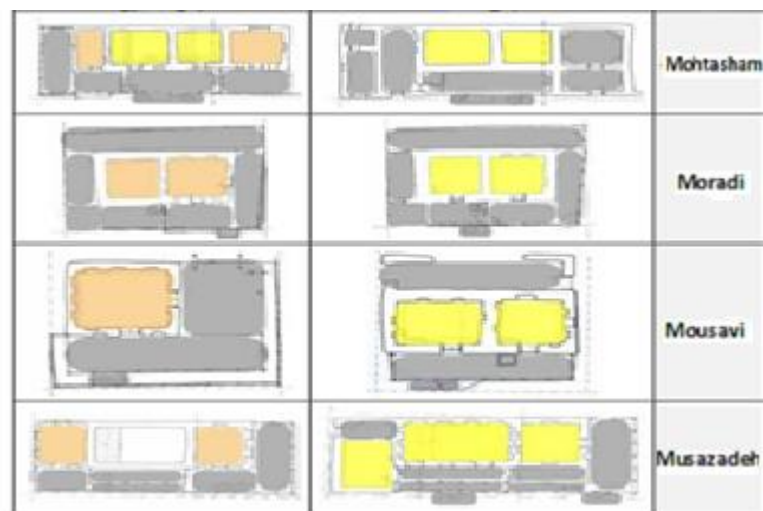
Spatial organization in the inner perspective (right side of ground floor plan and right side of first floor plan) - extroverted design.
